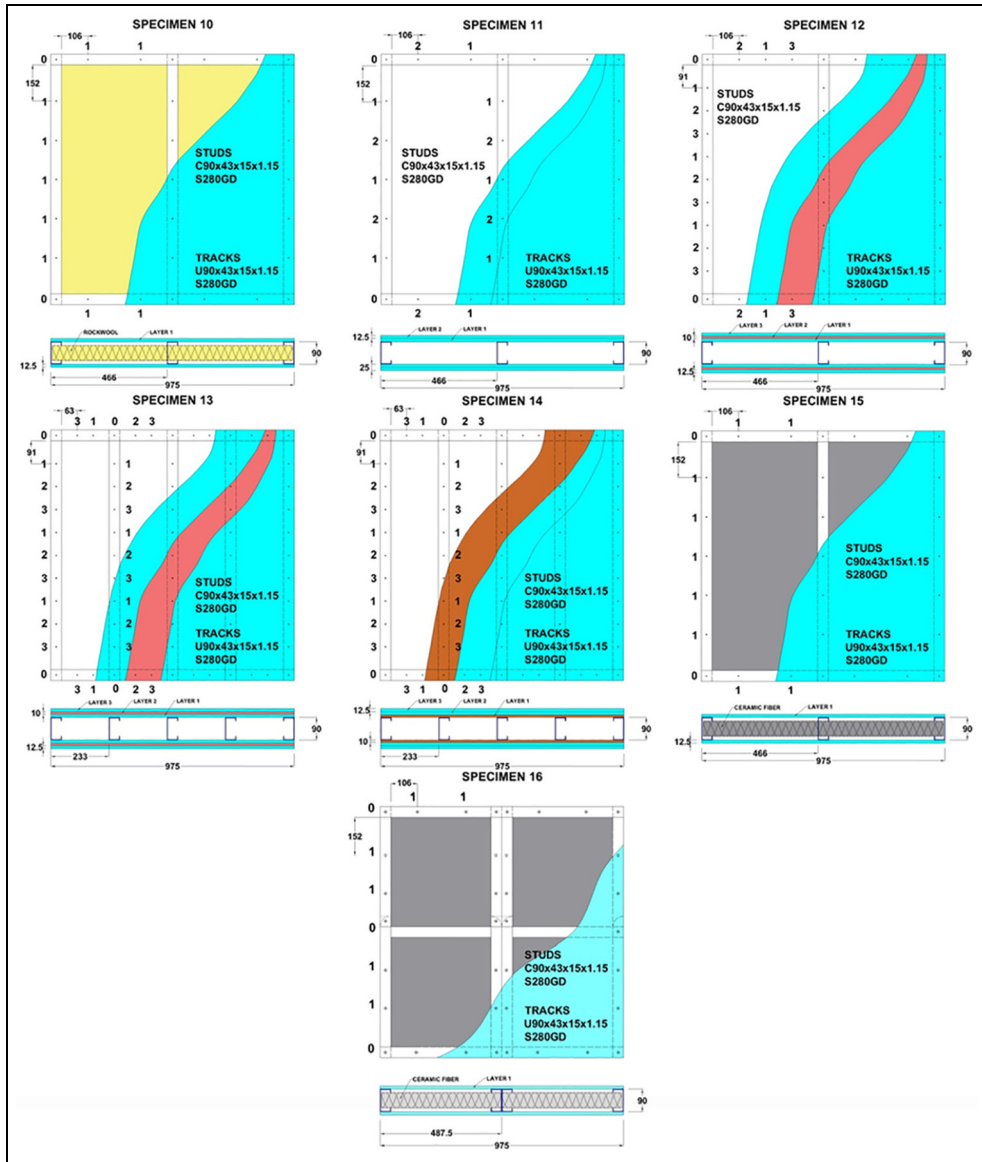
Specimen walls made with the LSF (dimensions in mm).
